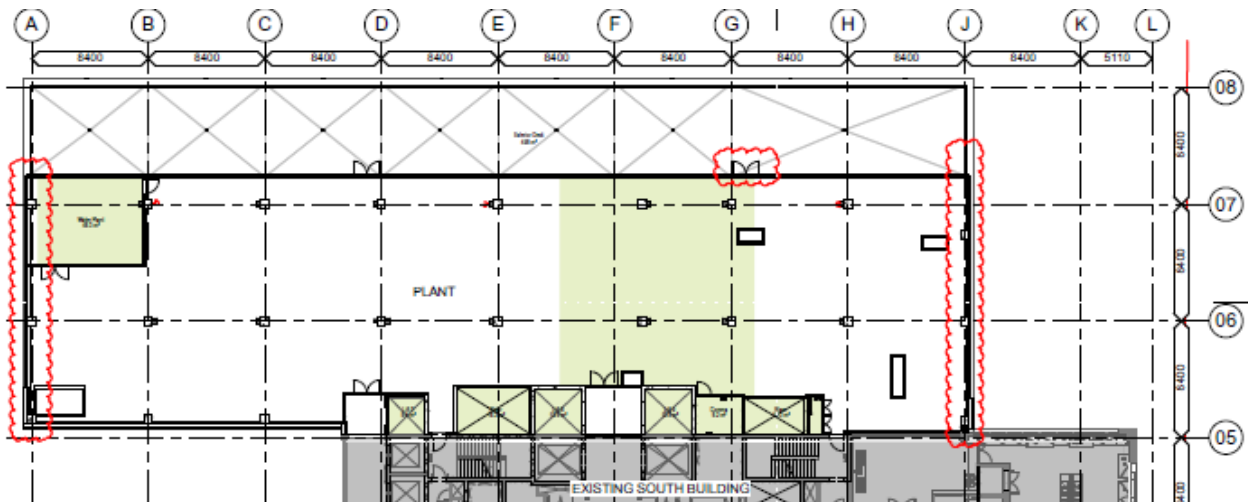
Proposed Amended Level 7 Plan (Source: CGA)
